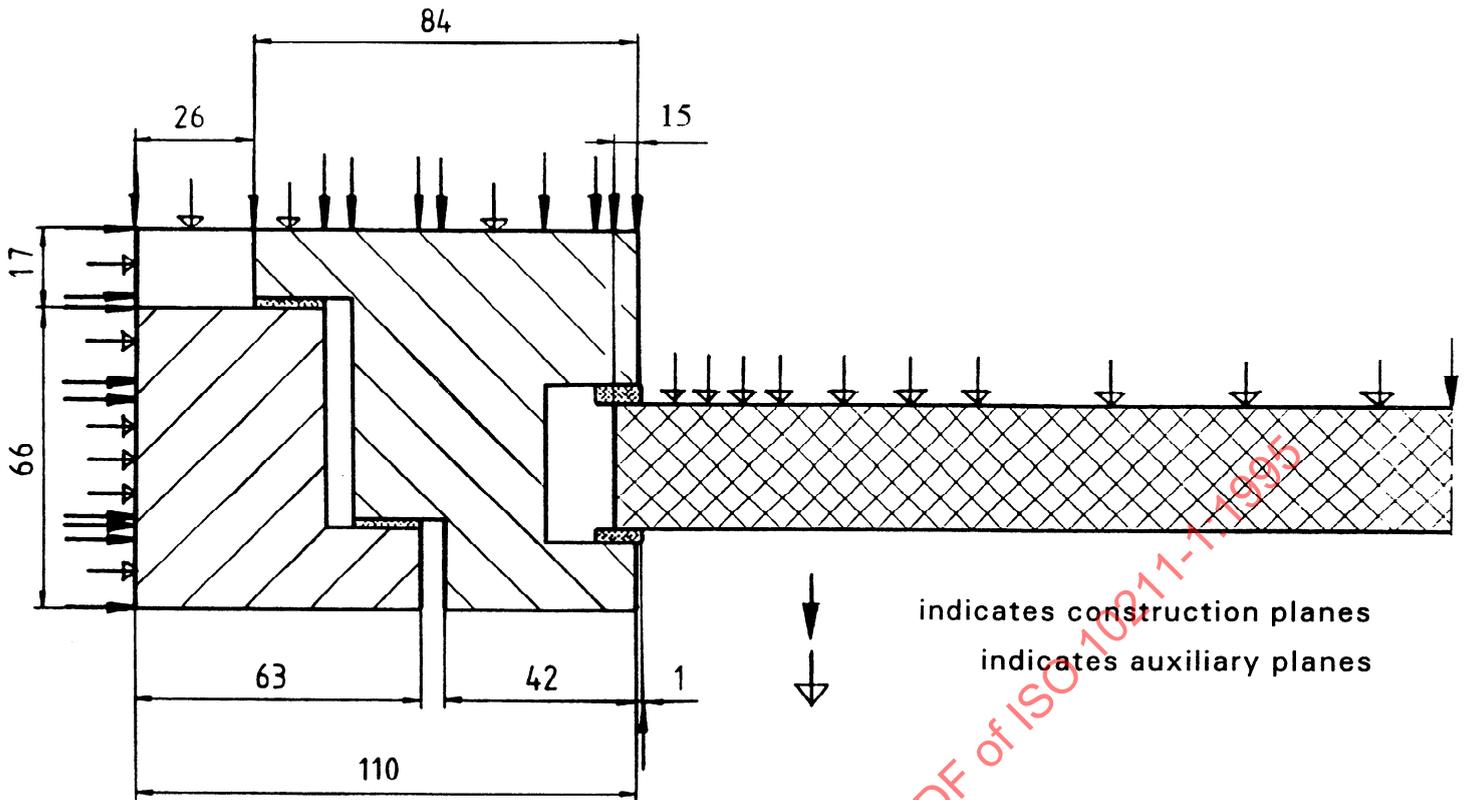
Example of construction planes and auxiliary planes in the 2-D geometrical model of a window frame
